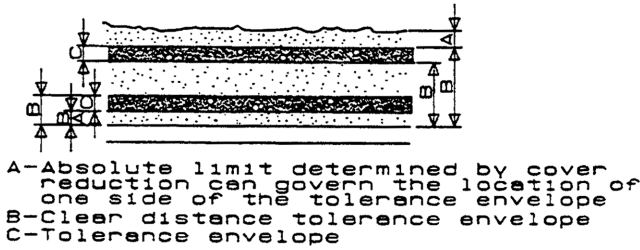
(b) and 2.2.3(b)—Reinforcement placement
